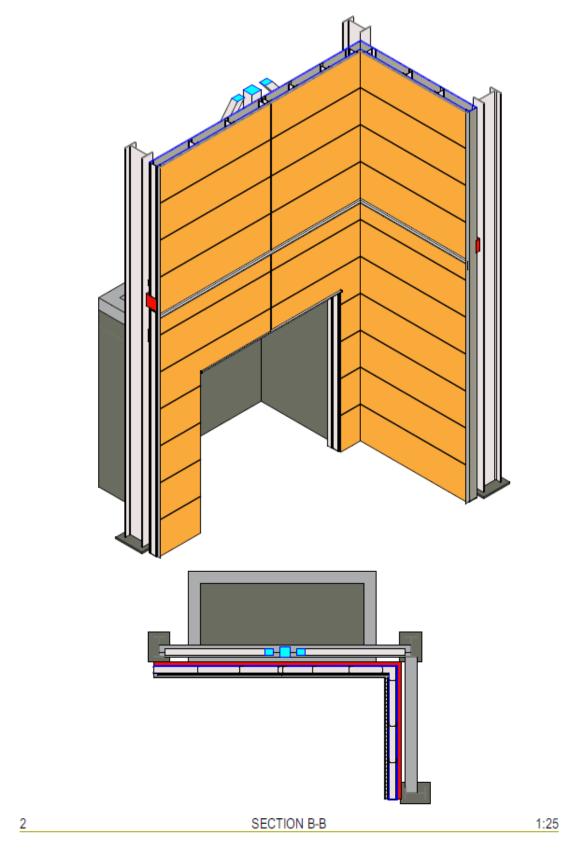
Cross-section (1st level main and wing walls) – provided by client
